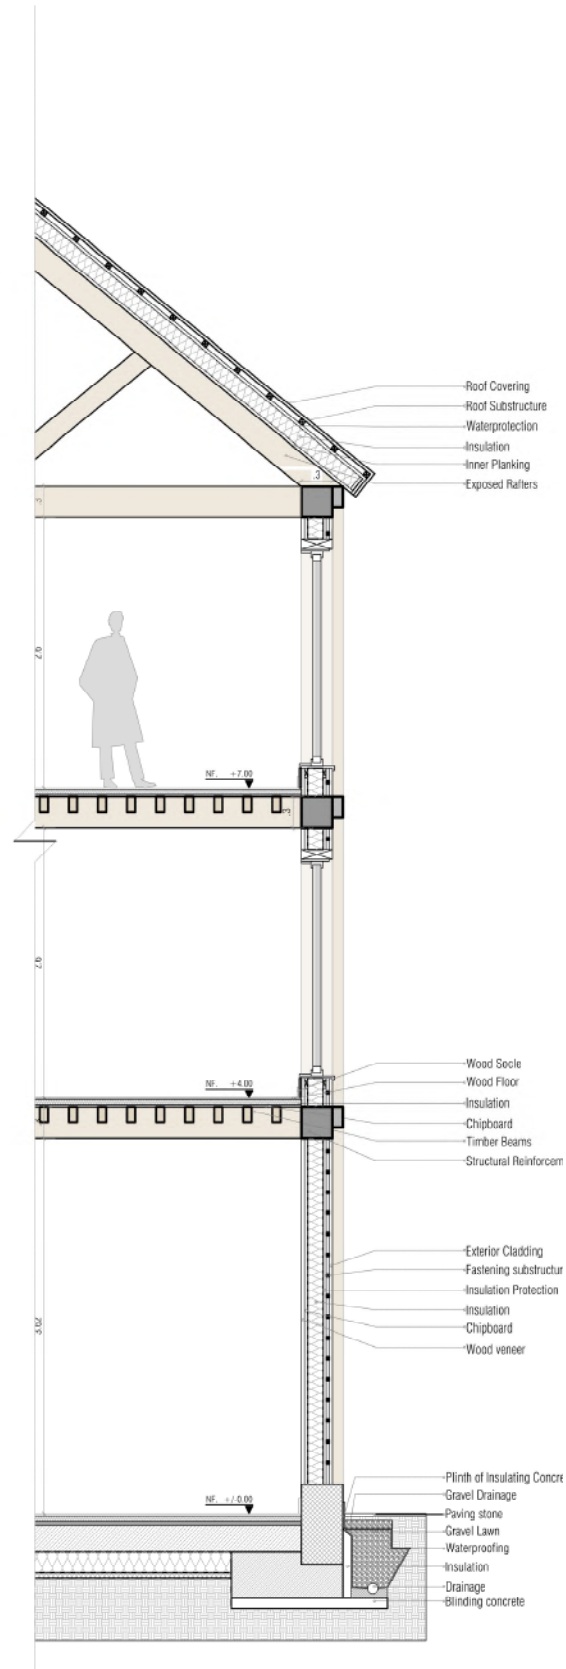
Detailed cross section of the facade of timber buildings. By author.
